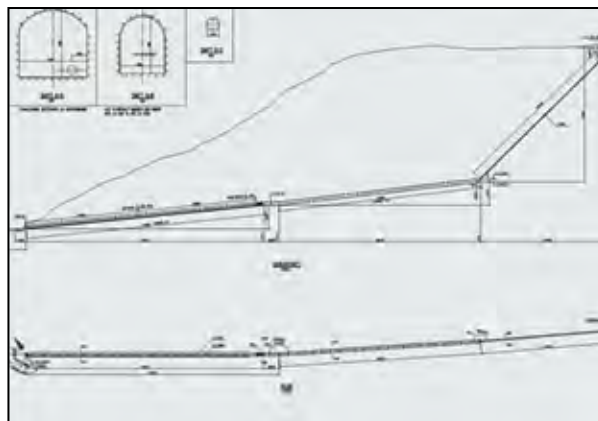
Alternative design with inclined shaft and unlined pressure headrace tunnel
